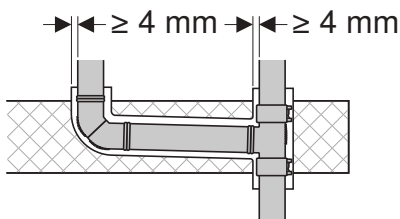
Insulation for decoupling with branch discharge pipes embedded in concrete
